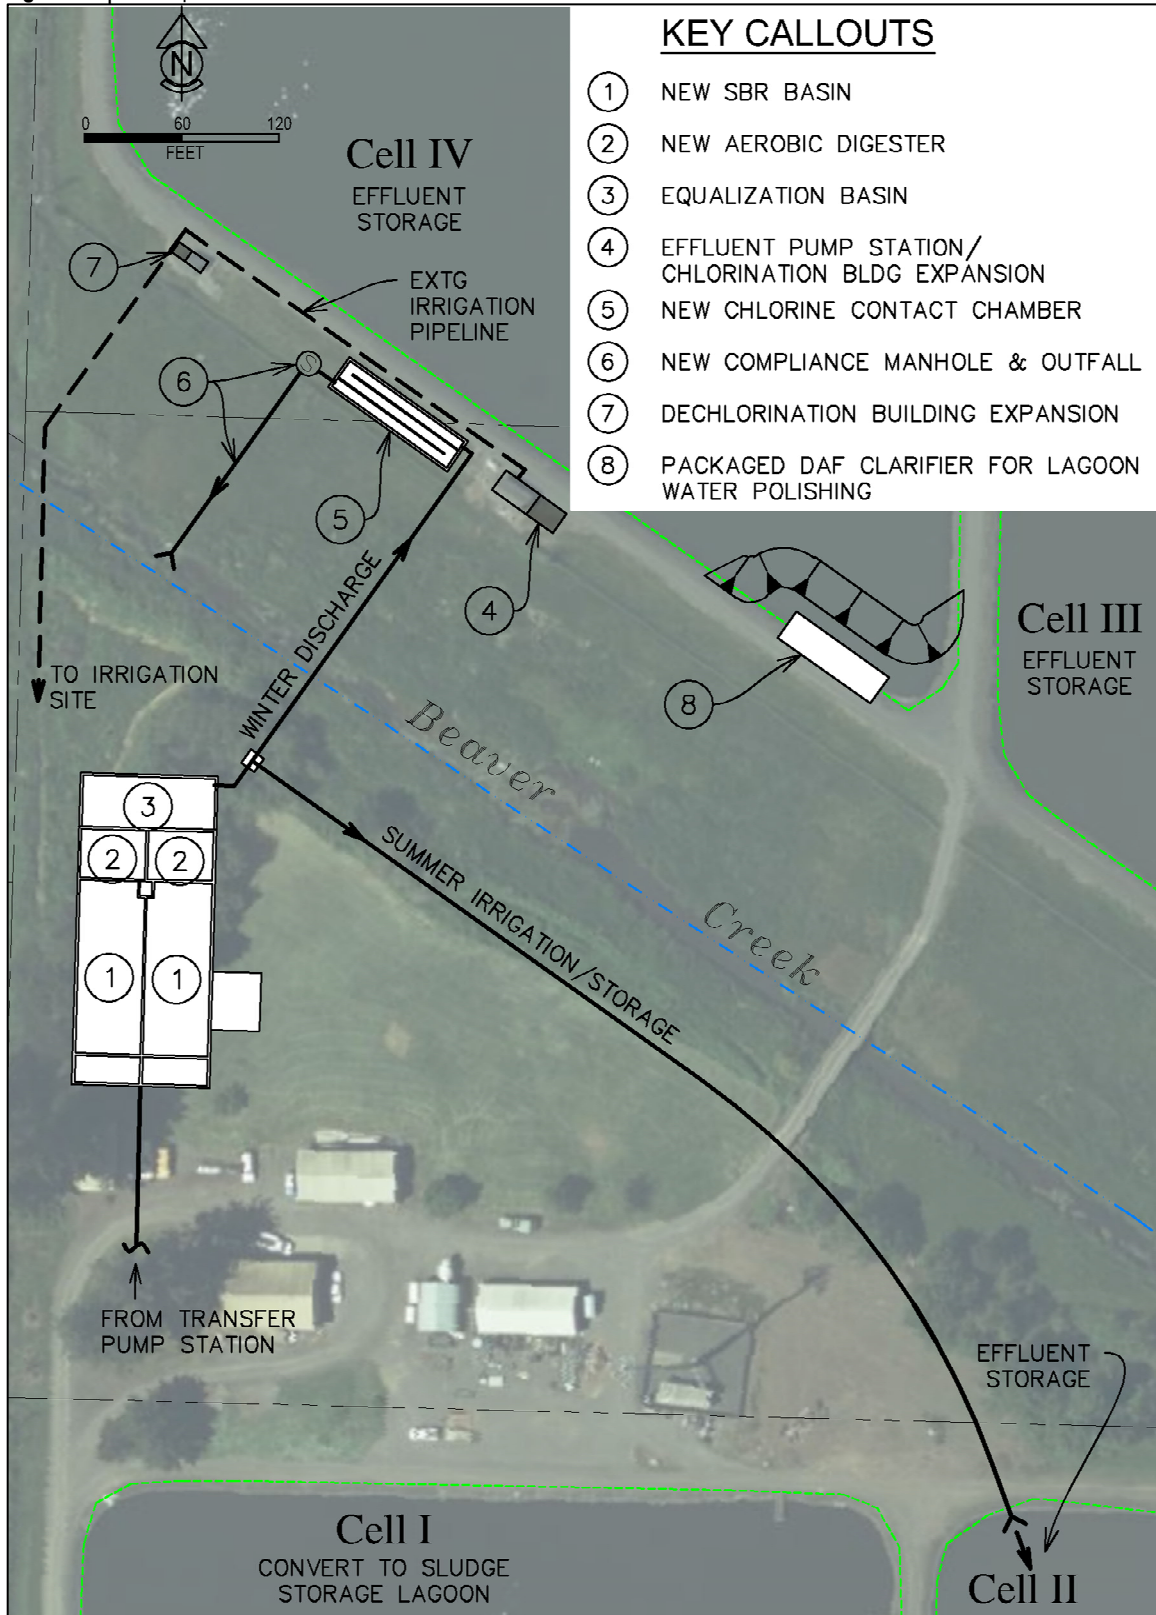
| Conceptual Site Plan- Treatment Alternative 1 – SBR Area
